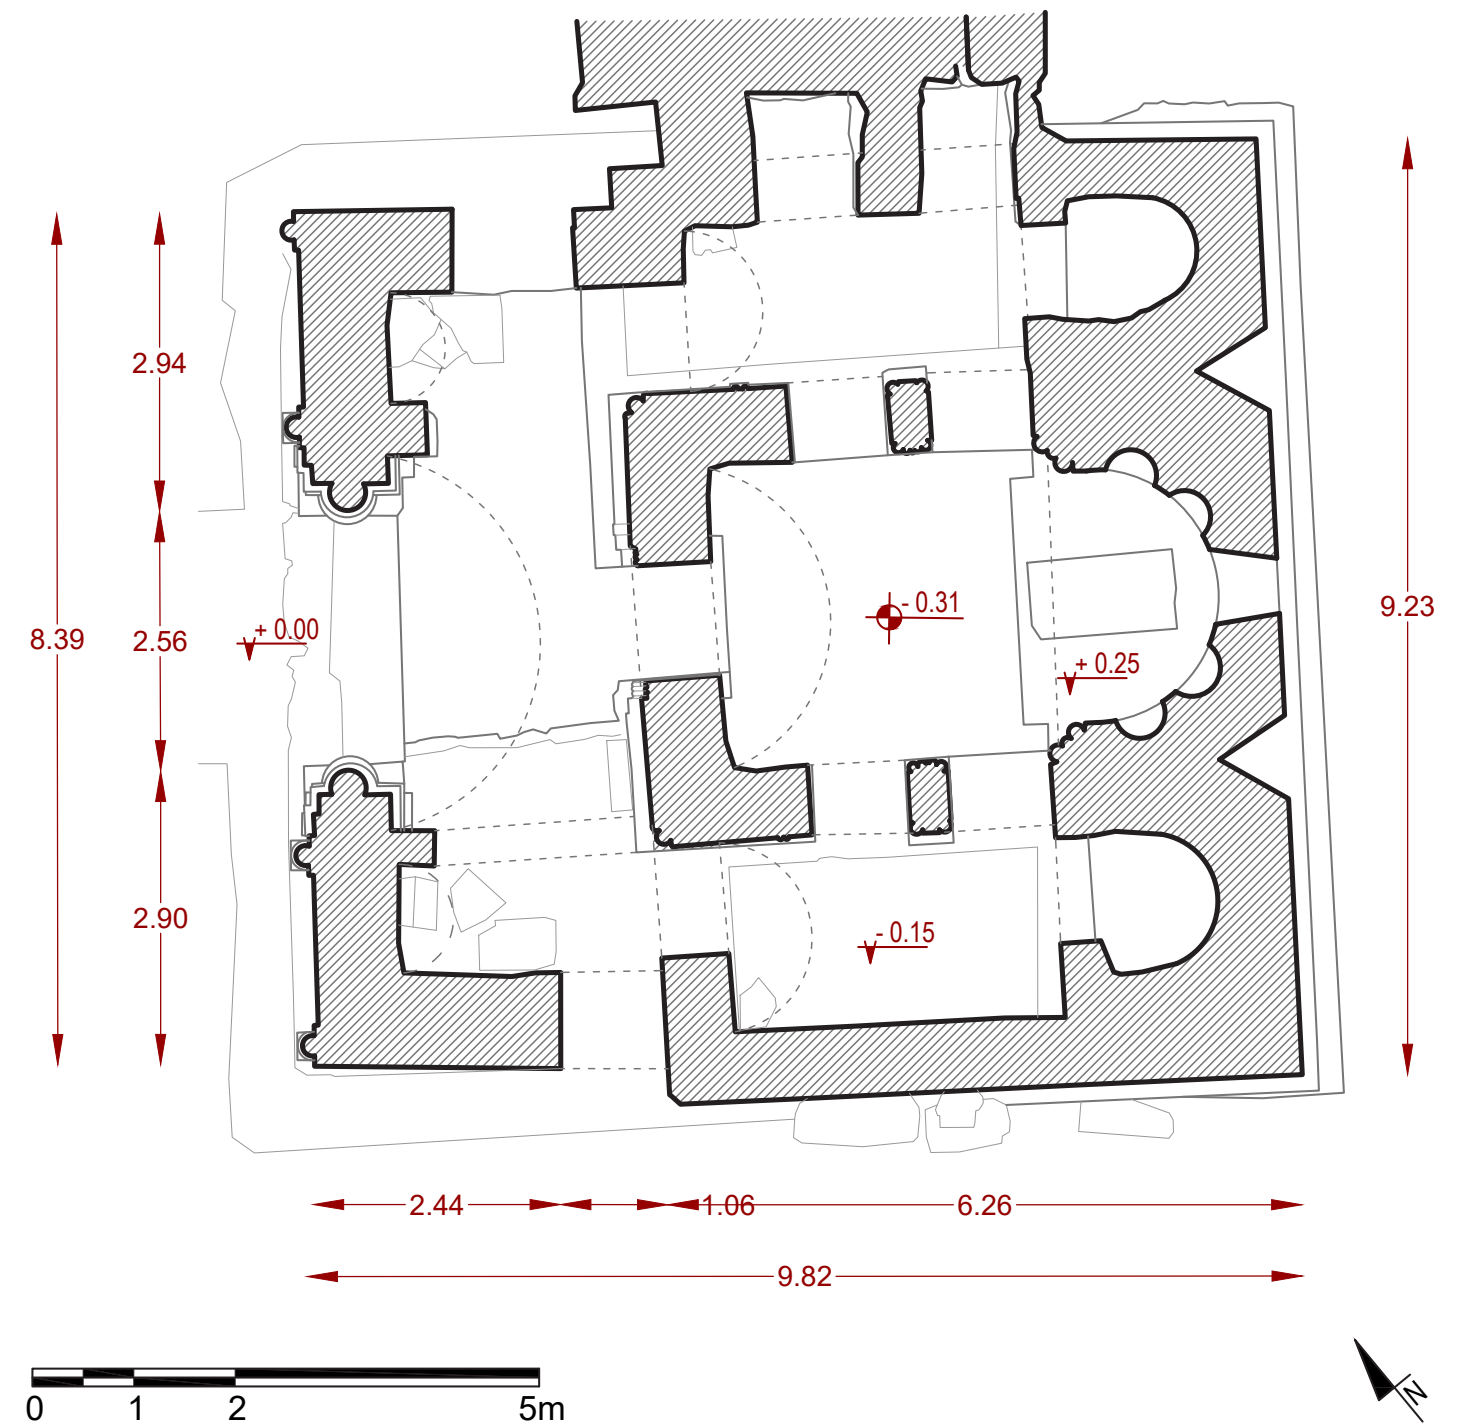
plan of Bgheno Noravank church (Iconem 2021)
